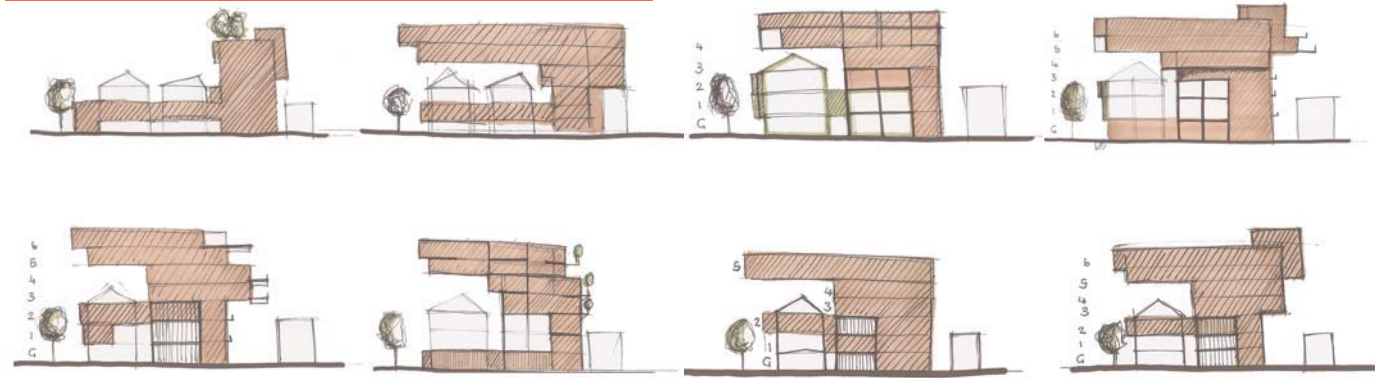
Series of sections through the site illustrating possible configurations of new versus old construction
